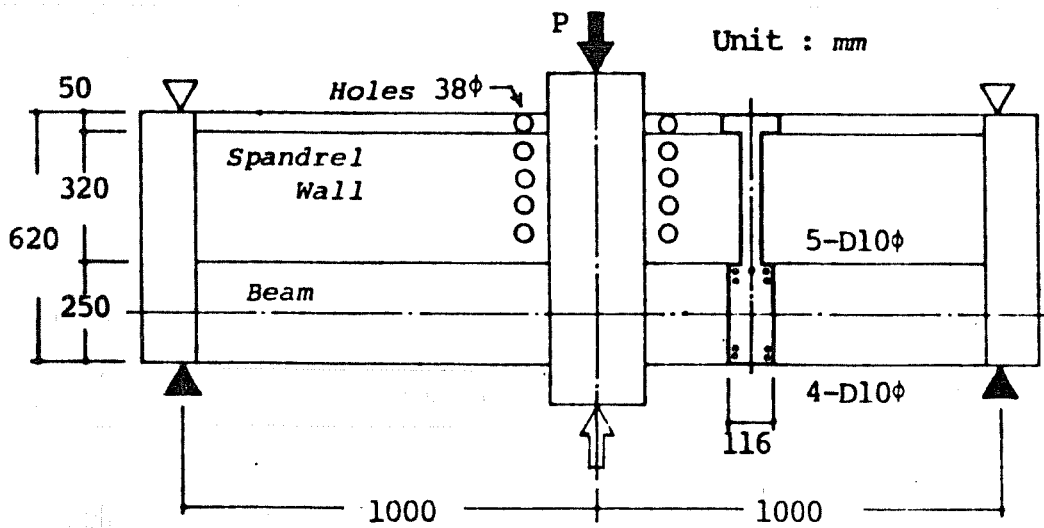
Test specimen for testing the spandrel beam weakening scheme [2]
